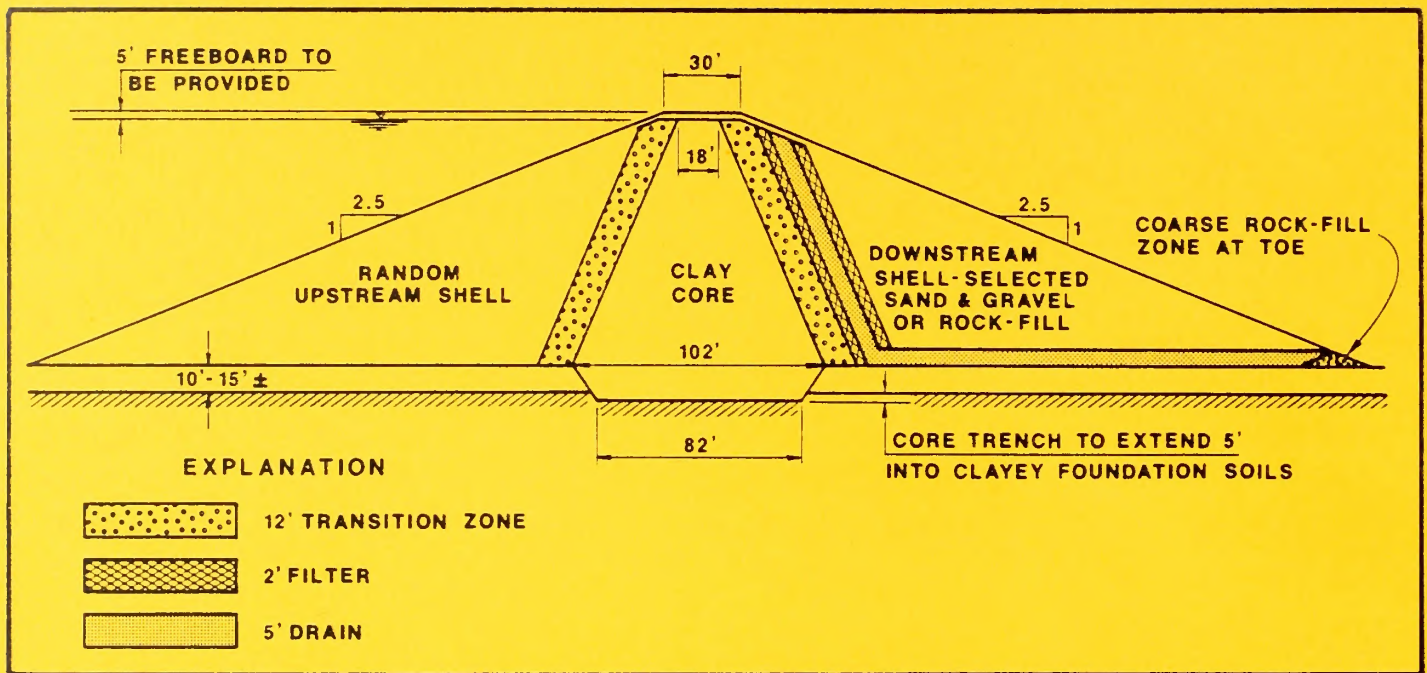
Schematic Cross Section of Zoned Earthfill Embankment With Central Core
